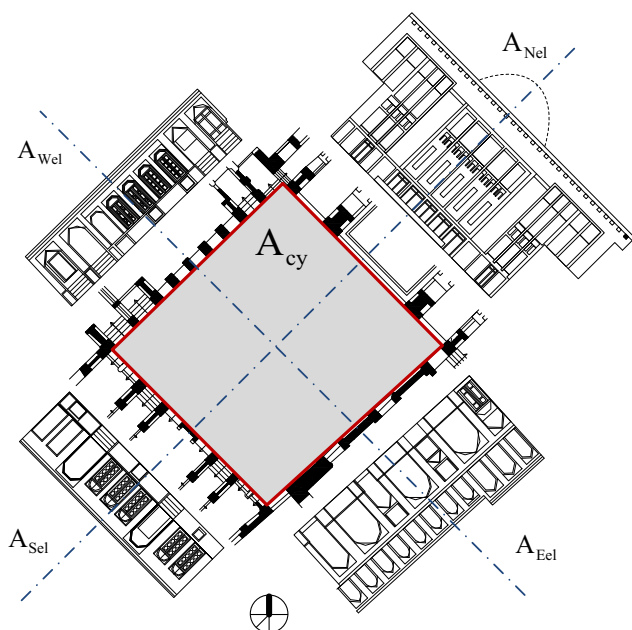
Courtyard's elevations in north, south, east and west of Nasir Almolk house in Shiraz.
